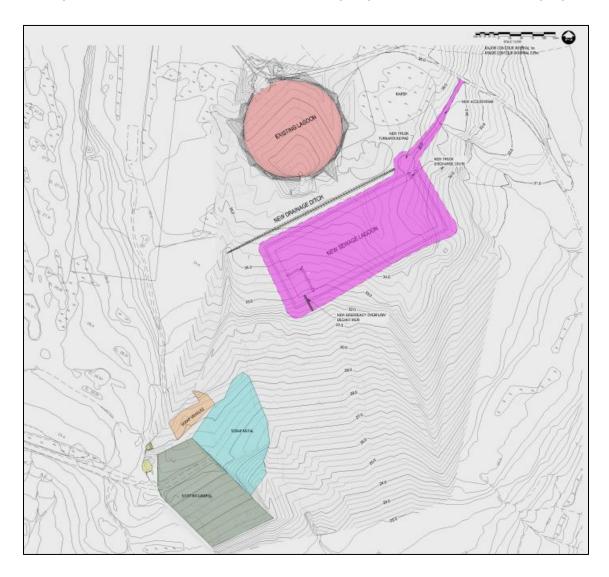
Site Plan of Existing Sewage Lagoon and New Sewage Lagoon
